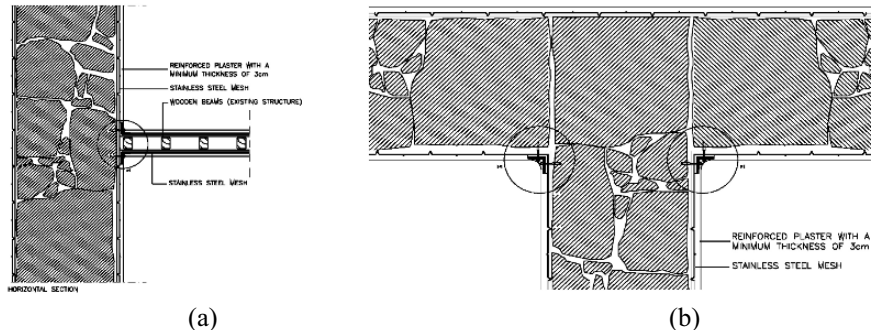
Connections to exterior walls (ground plans): (a) interior wall to exterior wall; (b) neighbouring partition wall to exterior wall
